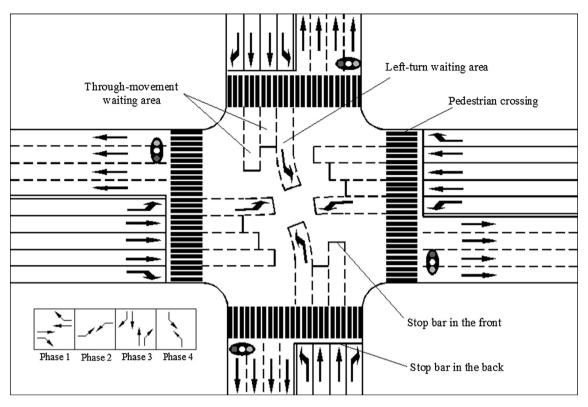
Typical design layout of signalized intersection with both TWA and LWA.
